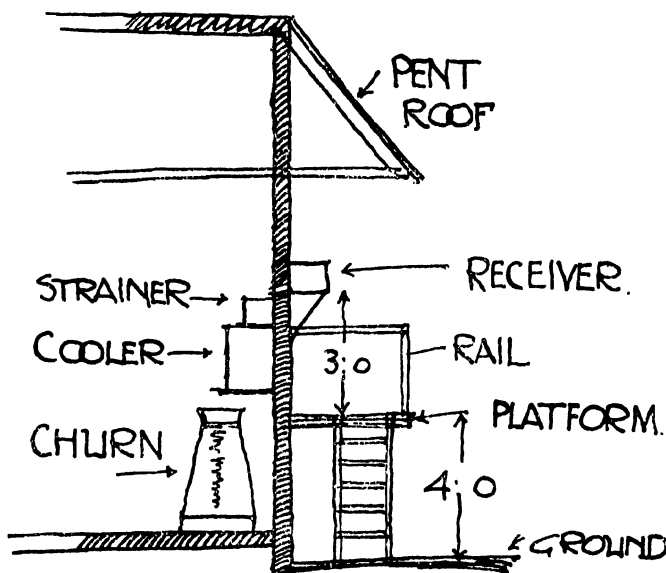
Beansheaf Farm : Section through Cooling Room.
